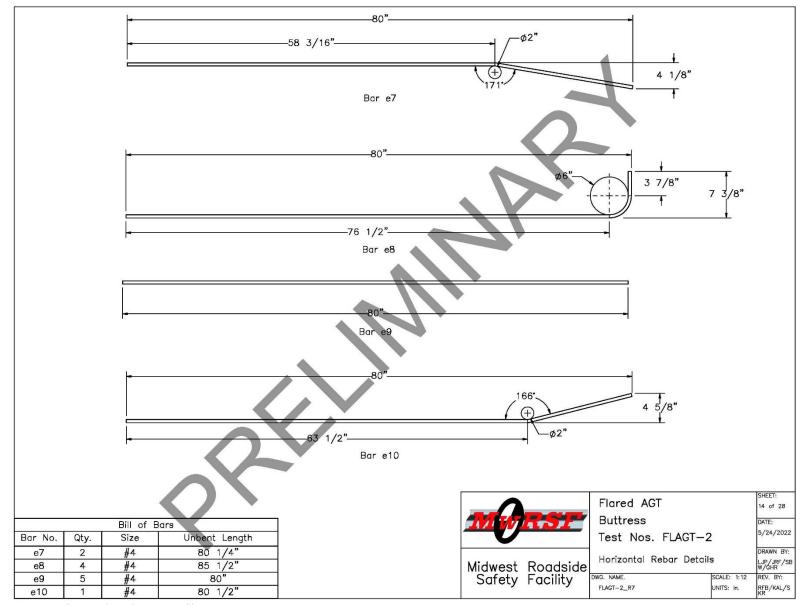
Horizontal Rebar Details, Test No. FLAGT-2
